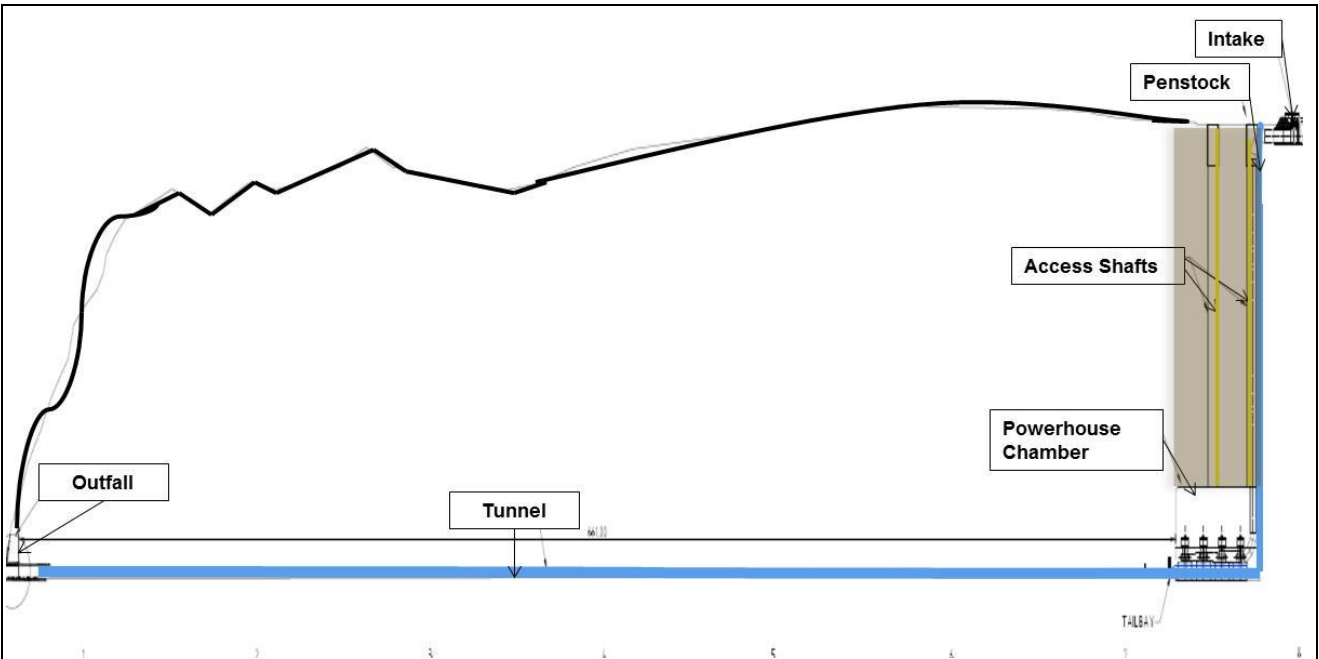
Schematic longitudinal section through penstock shaft, power chamber and tailrace
